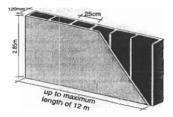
Gypcrete Rapid wall panel (BMTPC, n.d.).
